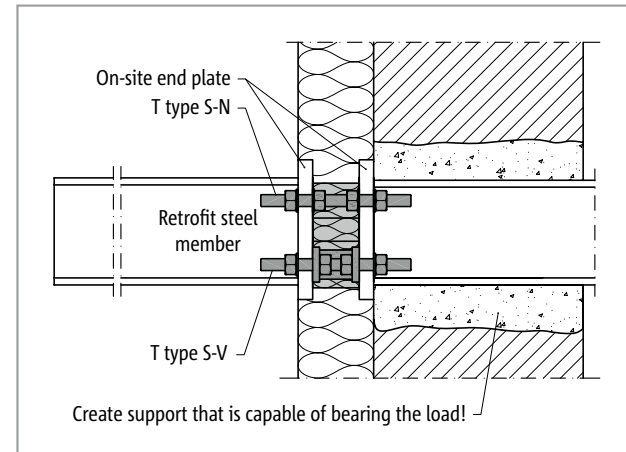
Schöck Isokorb® T type S for retrofitted cantilevered steel structure; further examples of renovation see p. 90
